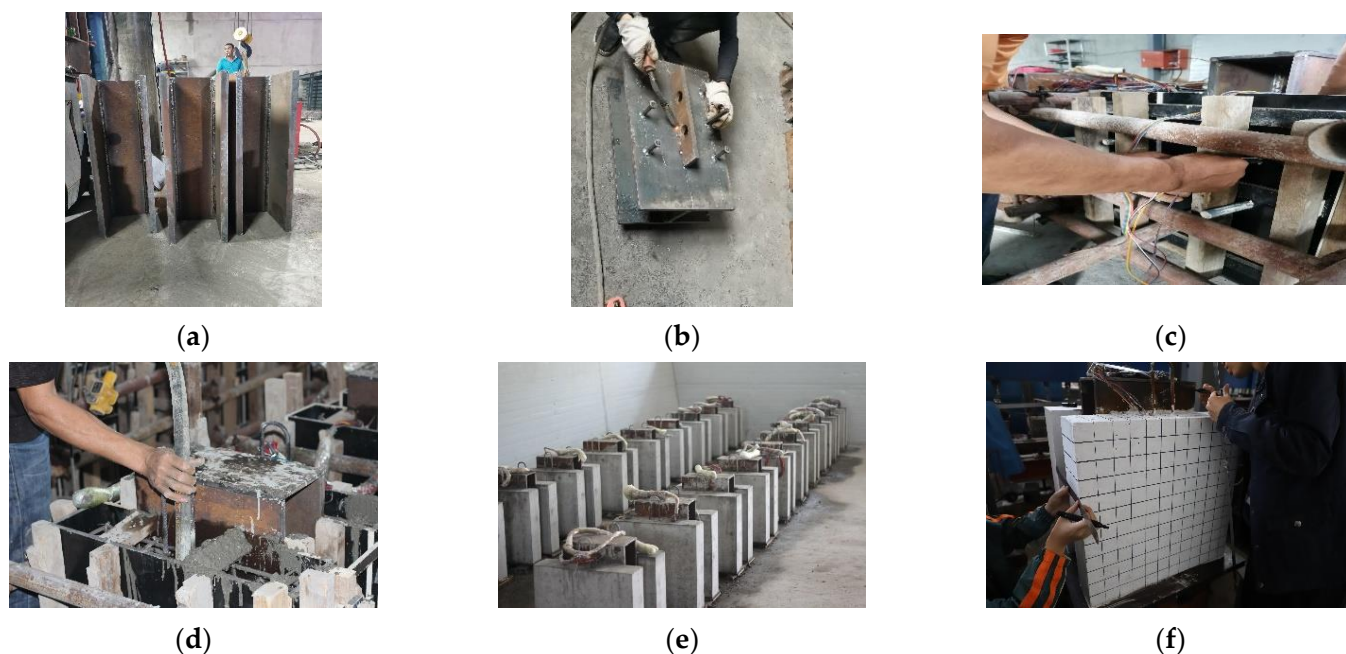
Fabrication of specimens: (a) machining H-beams; (b) welding perforated steel plate; (c) fixing penetrating rebar; (d) pouring concrete; (e) curing concrete; (f) drawing grids.
